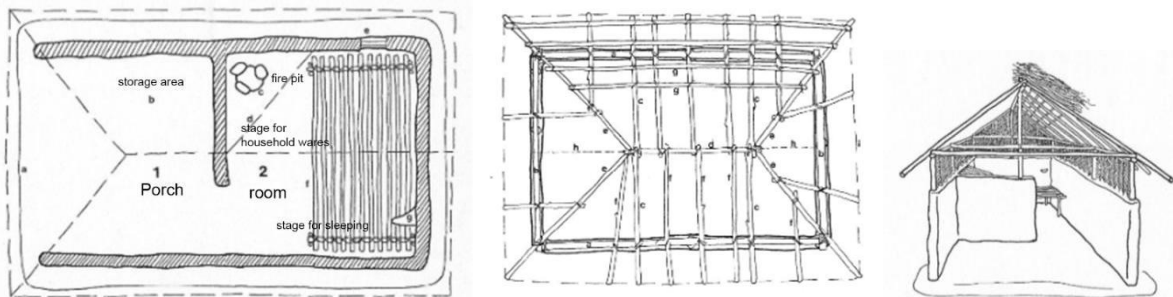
, 13, 14. Typical floor plan, typical roof plan, perspective view
